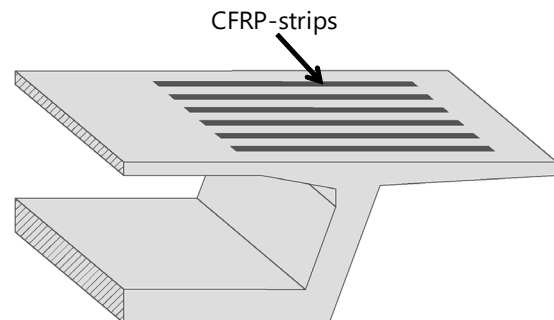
Half-cross section of a hollow box girder bridge. CFRP application for the strengthening of the lateral cantilever.
